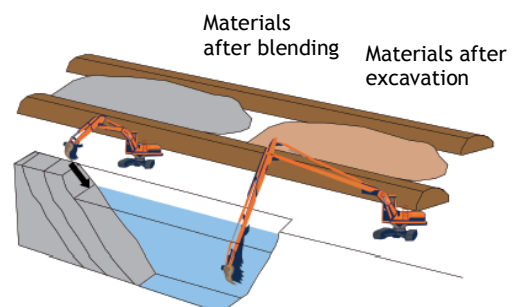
Schematic of slurry wall excavation under bentonite slurry
